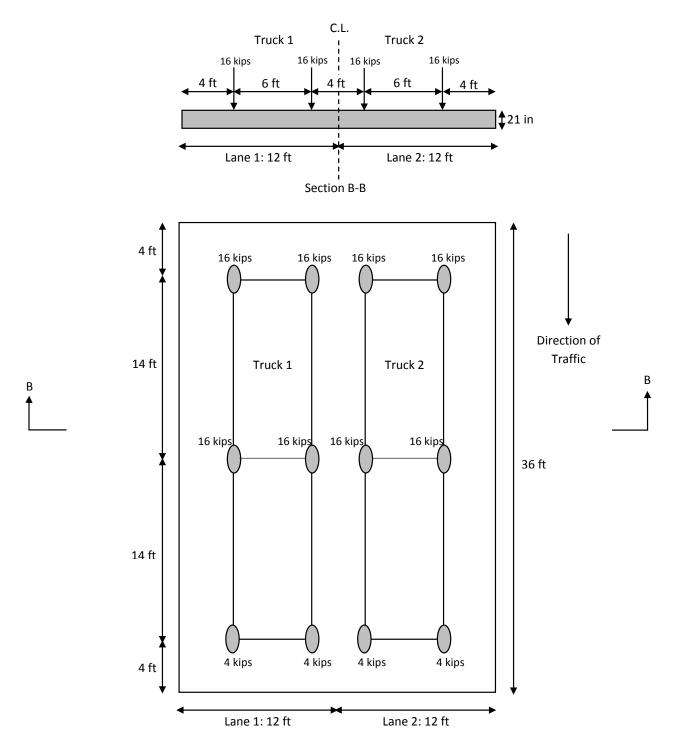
Typical Cross-Section and Plan of Two-Lane 36 ft Span Bridge under Center-Center Loading Condition with no railings
